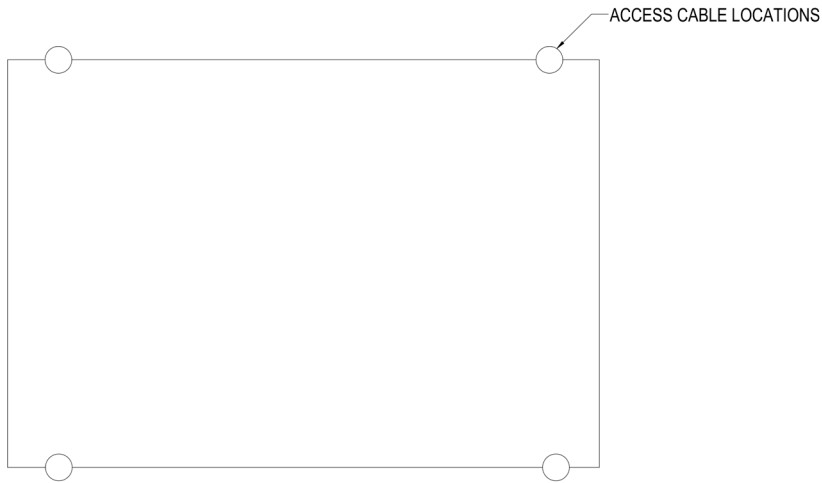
ACCESS CABLE LINEAR ADJUSTMENT
